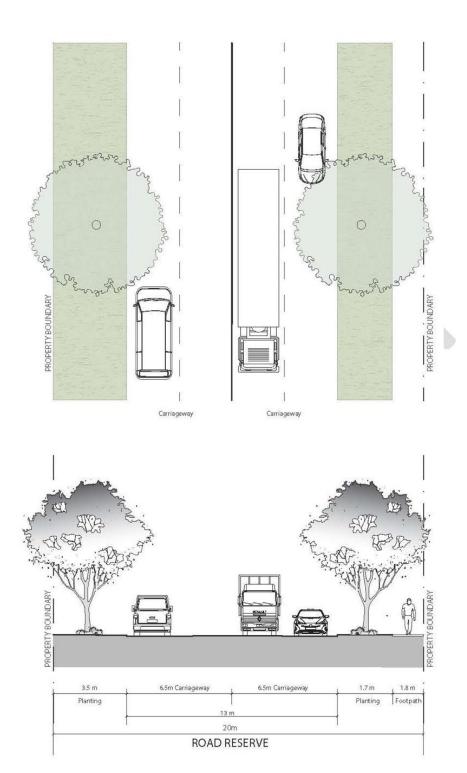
B: Employment Land Local Street with Footpath (Road Section B as per Figure 3)
